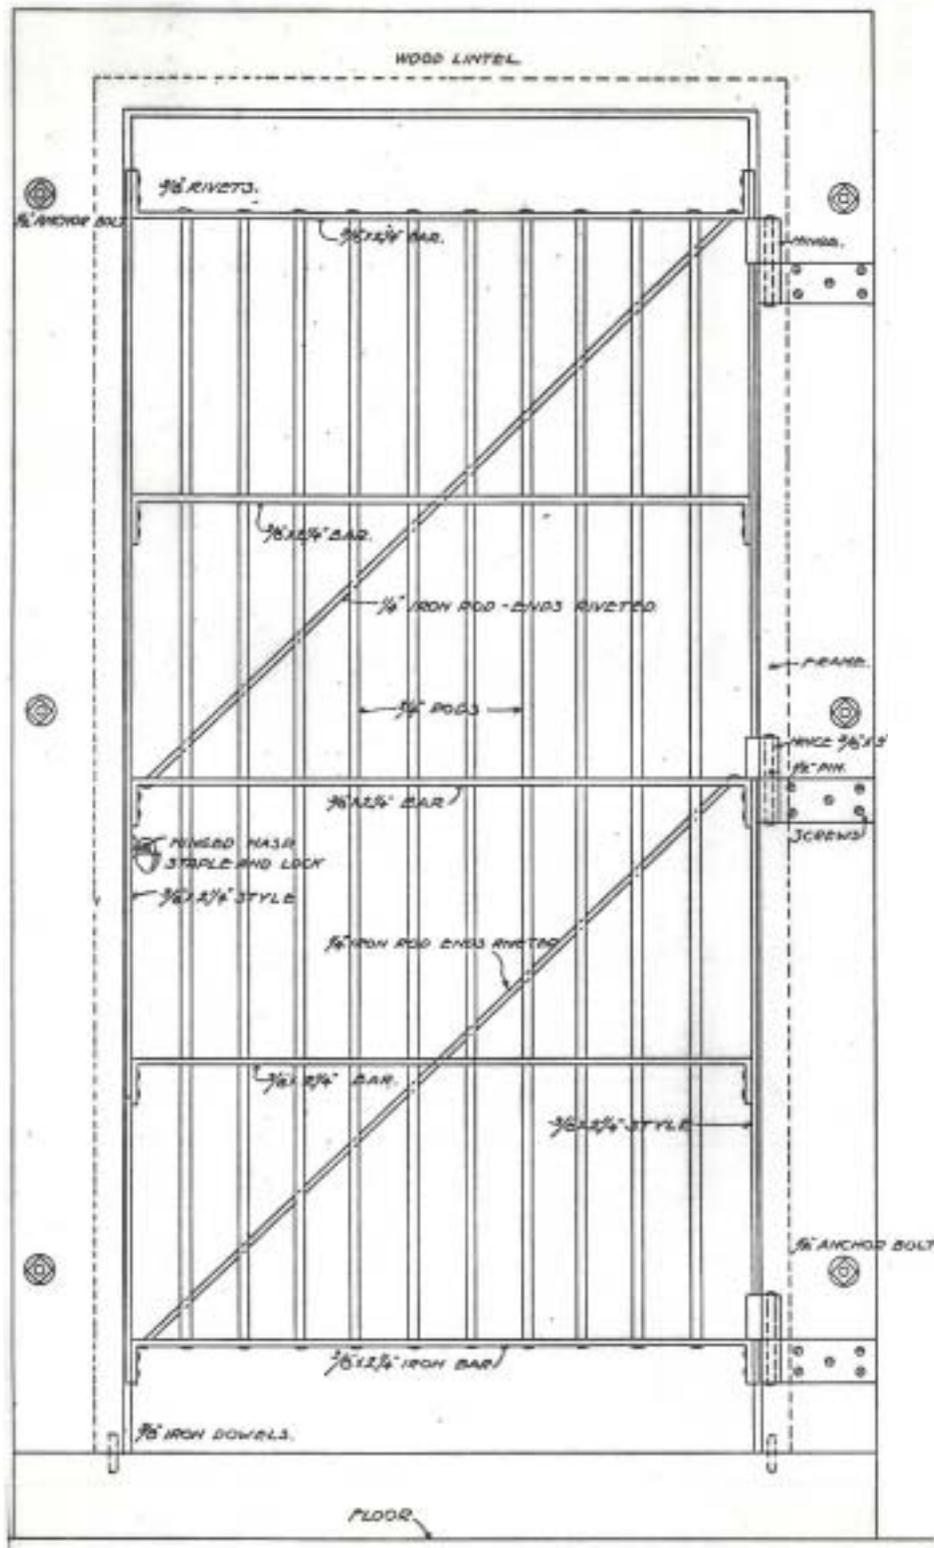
Inside elevation of iron grille door for basement doorway (D- o), as designed on original 1894 drawings.
